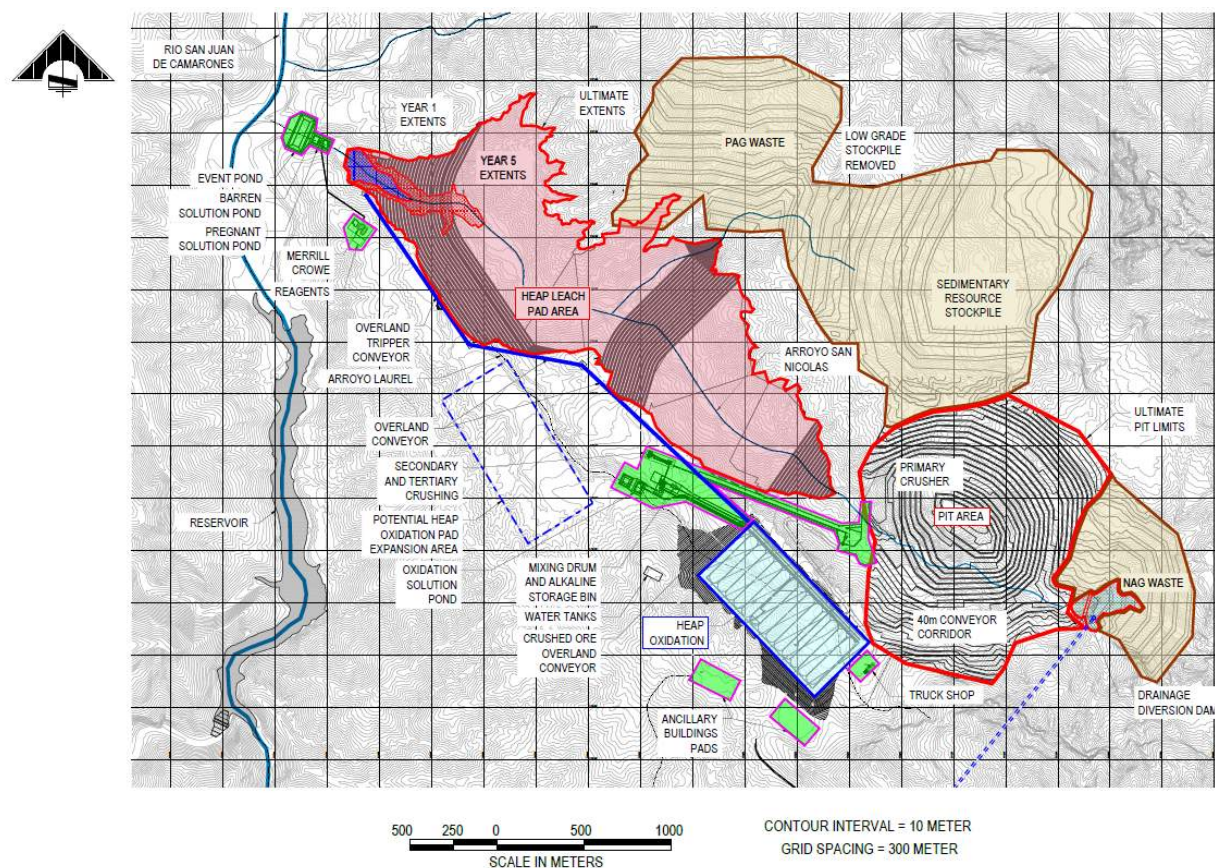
General Arrangement of Open Pit, Stockpile and Waste Rock Dumps and Process Facilities
